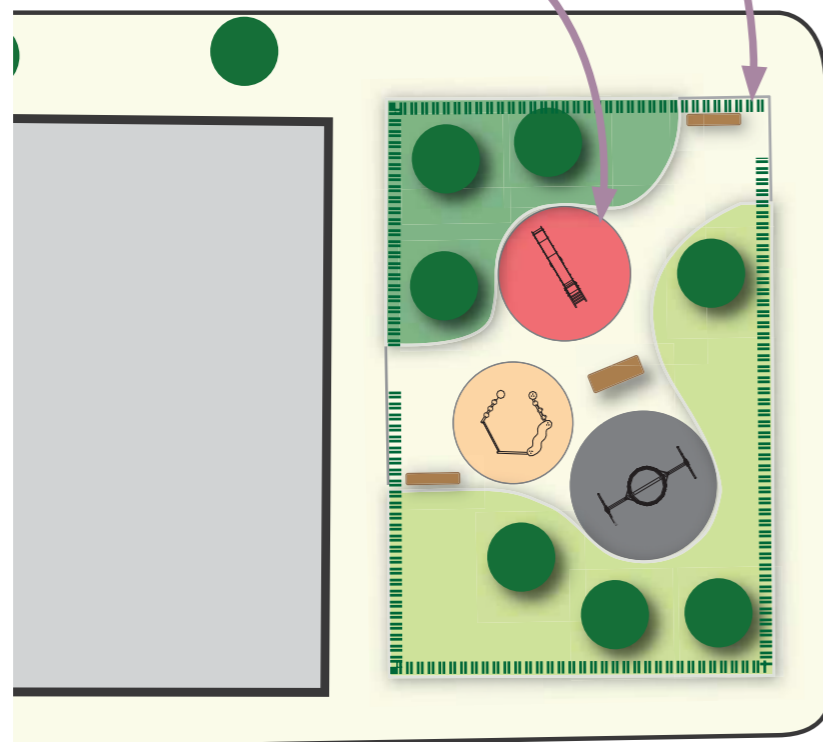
Sketch plan illustrating an arrangement of play equipment with safety surfacing, seating, tree planting and natural enclosure
